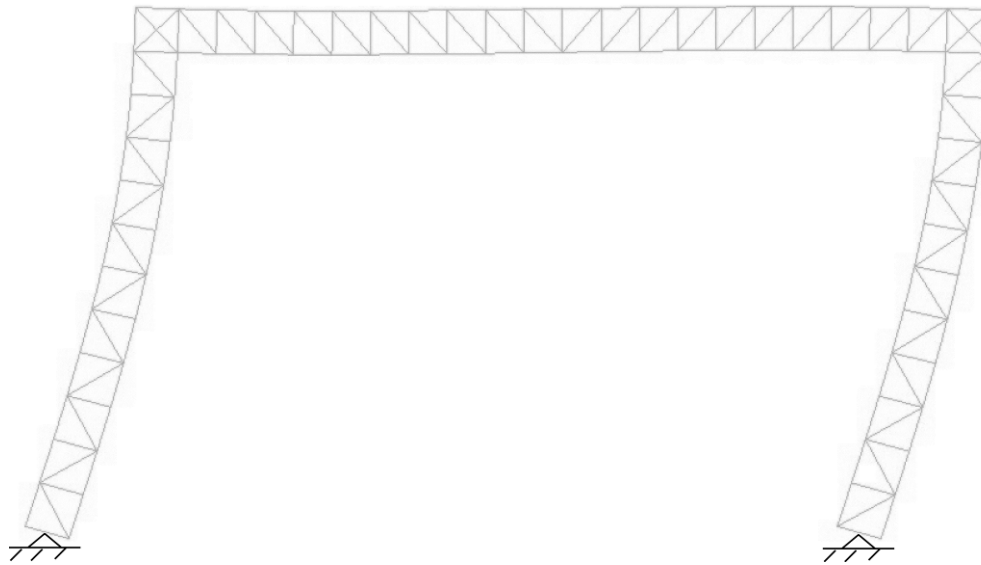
Single-story sway frame with laced built-up columns and truss beam
